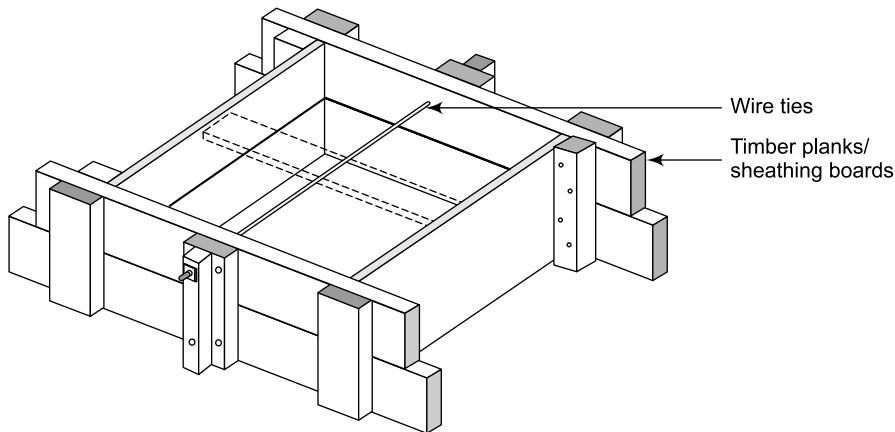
Column Footing Showing the End Sections of Exact Dimension and Side Sections of Extended Length. Also Notice the Internal Tie Arrangement.
